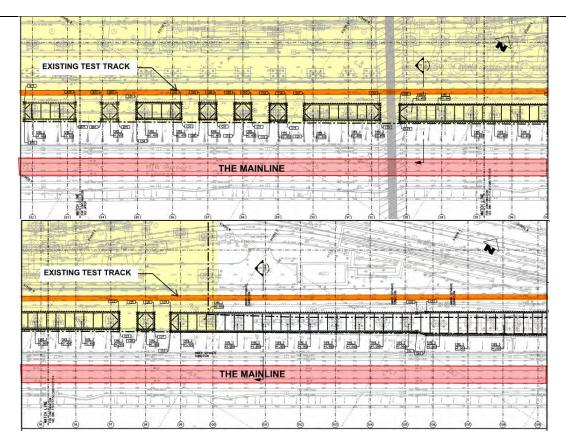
Sheet Pile Layout Plan - G.L. 85-97/P-Q (Top) and G.L. 95-109/P-Q (Bottom)
